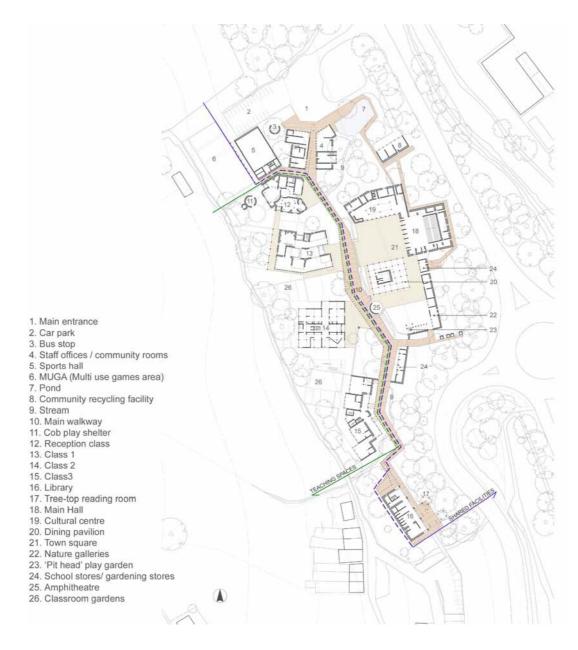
Ground floor organisation plan of authors design for Williamstown Primary School
